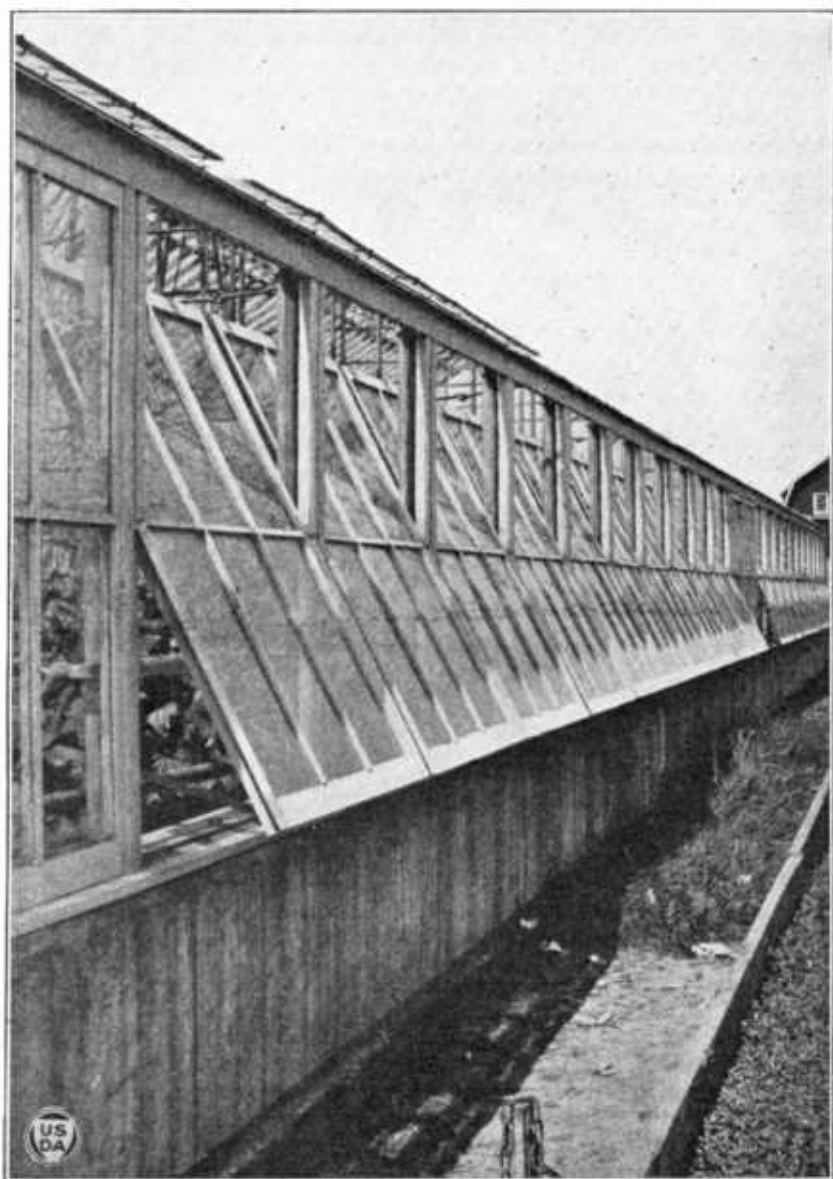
A type of construction where the portion of the wall of the greenhouse between the masonry and the gutter is taken up with ventilators.
